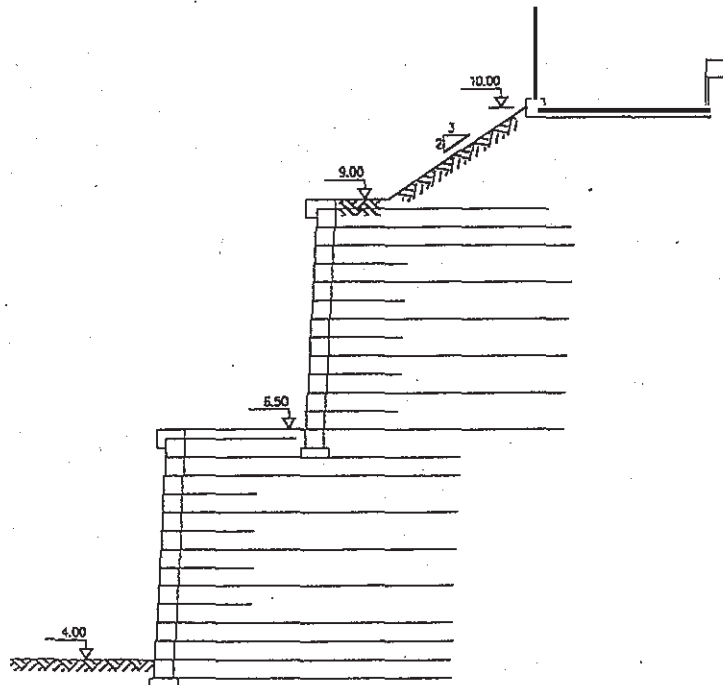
Cross-section of the Manavgat Geosynthetic Reinforced Segmental Retaining Structure
